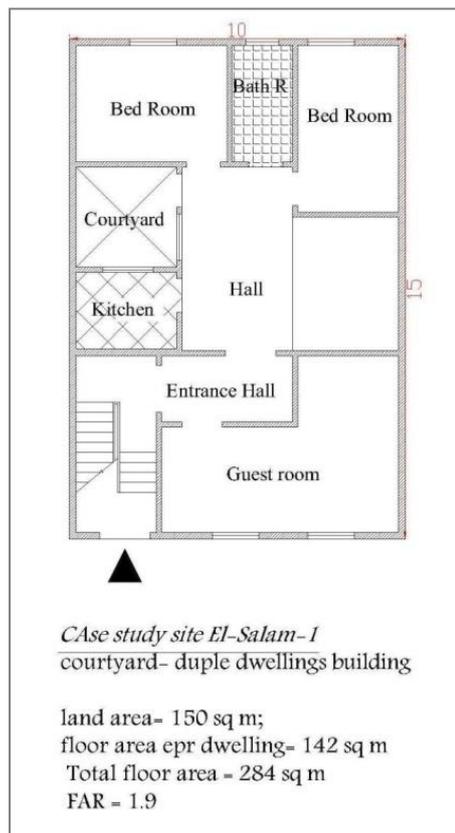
15: Floor Plan, Site Four - El-Salam-I
